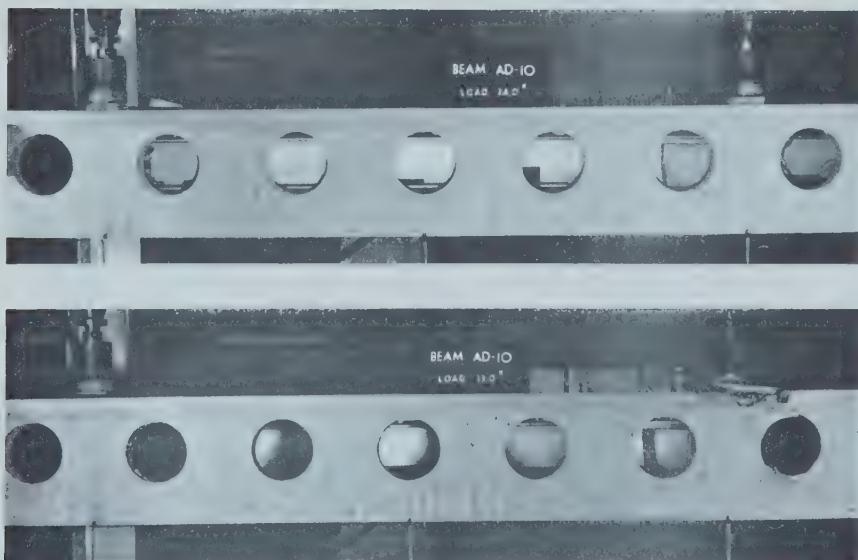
BEAM AD-10 CRACKING AND FAILURE PATTERNS
